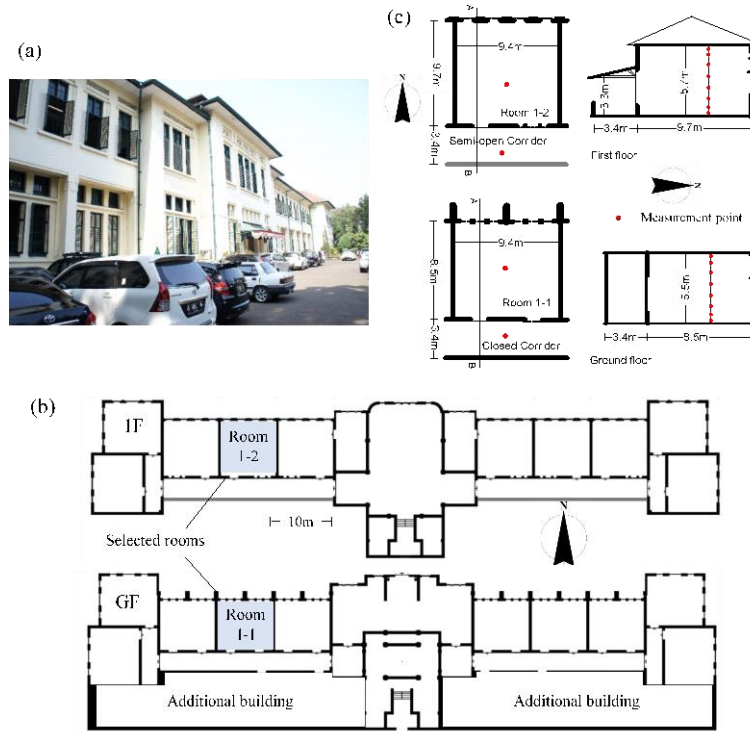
Case study buildings: (a) Views of Case study 1, (b) Floor plan of Case study 1 and (c) Floor plan and section of selected rooms (Room 1-1 and Room 1-2).
